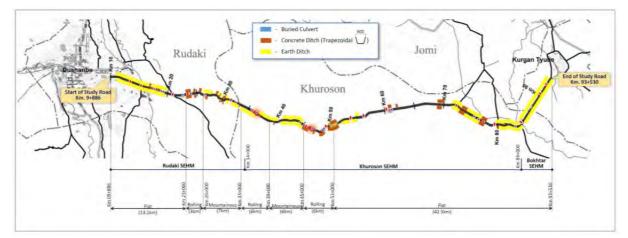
ROADSIDE DRAINAGE ALONG DK ROAD
